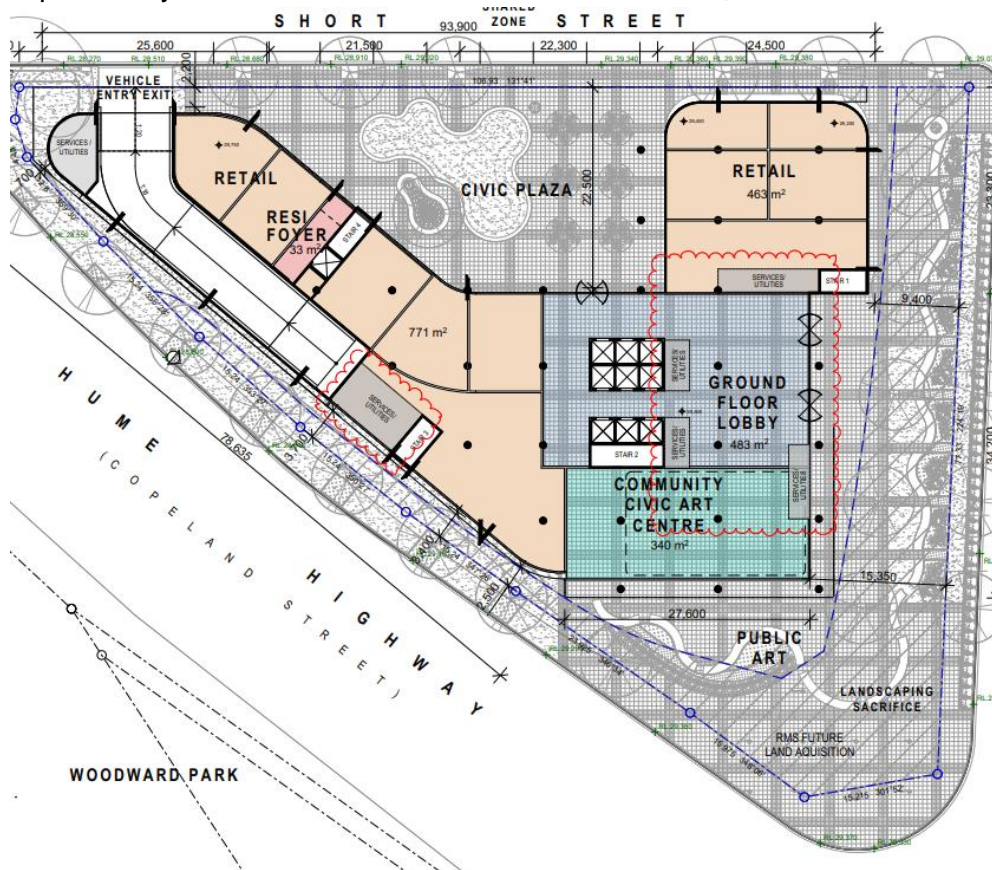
Ground floor plan of Building indicating location of RMS acquisition
